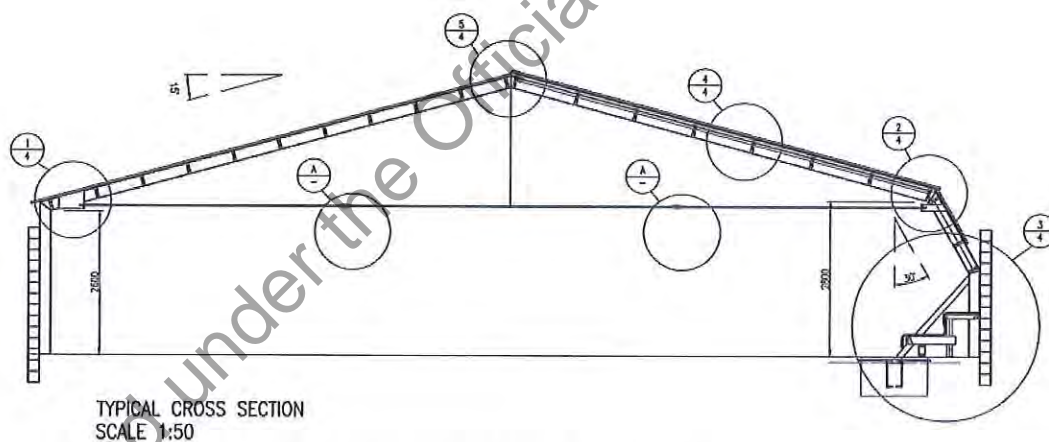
Typical cross section following improvement works undertaken in 1999
